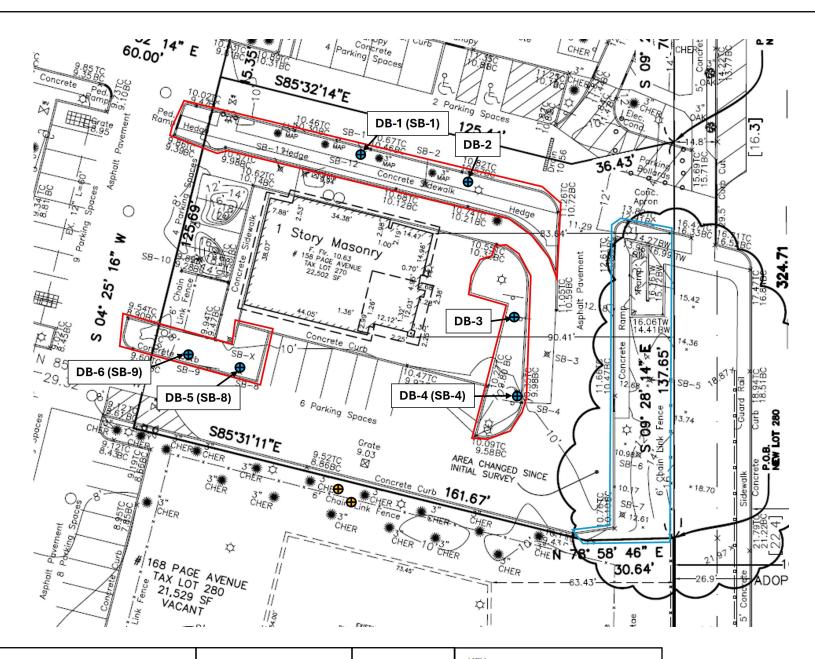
236 Richmond Valley Road Work to be Performed
